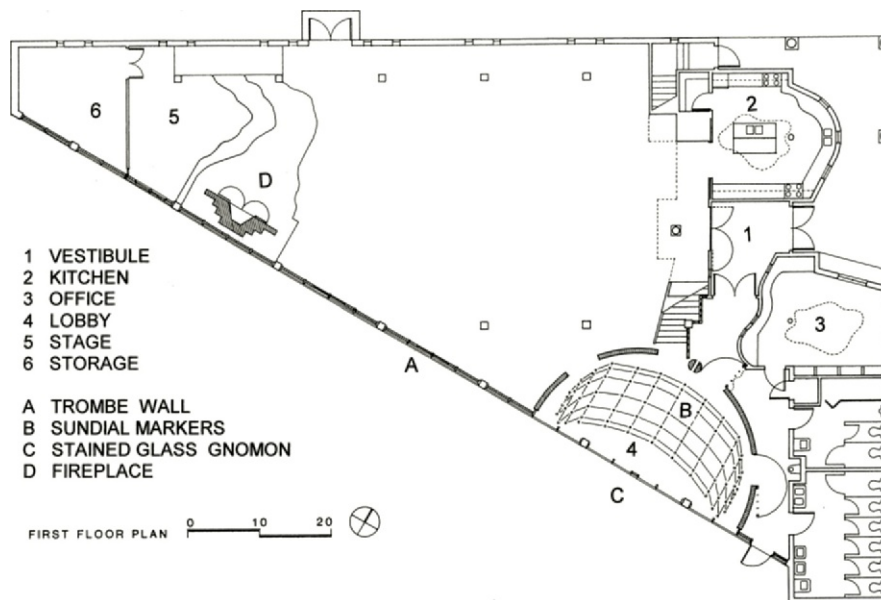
In the lobby (area 4) a stained-glass gnomon projects the time and date in the room-size sundial embedded in the floor slab. The triangular shape of the buildings makes the south wall the largest of the three walls. (Courtesy of Bohlin Cywinski Jackson Architects.)
